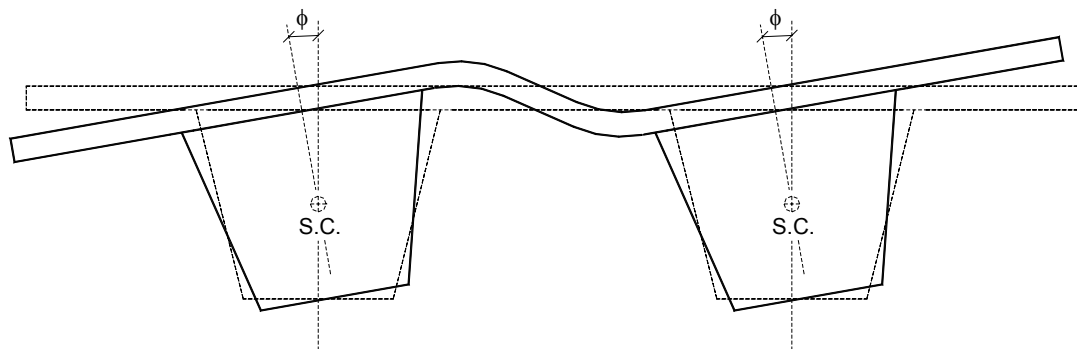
DIFFERENTIAL GIRDER ROTATIONS CAUSING SUPERELEVATION MISALIGNMENT (MEMBER, 2002)
